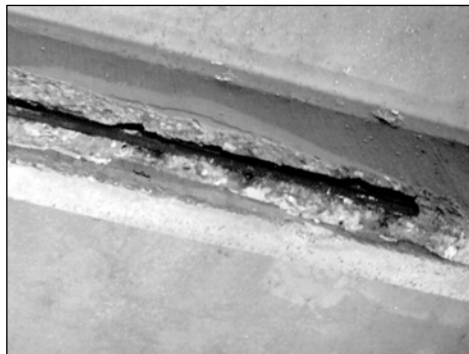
Prestressed concrete roof element ECP: cracking and spalling of the concrete cover; advanced corrosion of the non-pre-tensioned steel bar at the bottom of the rib.
